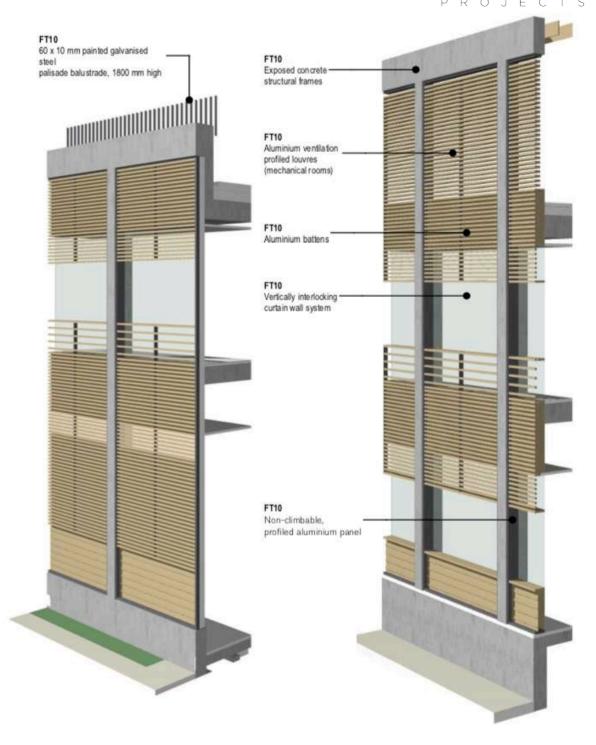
Building J/H Façade Type Extent – Exposed concrete structure with metal and aluminium detailing (Source: FJMT, DA-5908, 18.12.19)
